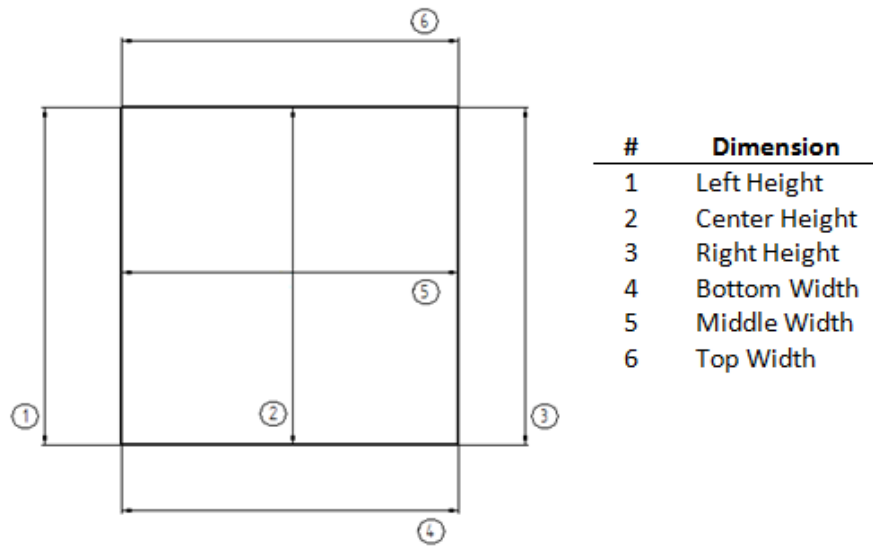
Placement of cross-sectional as-built dimension measurements.
